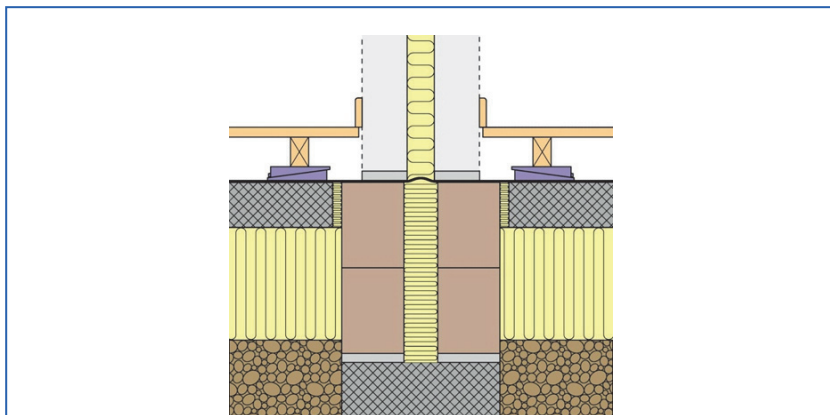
Example of Danish heavy cavity wall construction for new terraced housing fulfilling the Danish Building Regulations 2010. Cross section through party wall showing the foundations. [[2] - (Denmark)].
